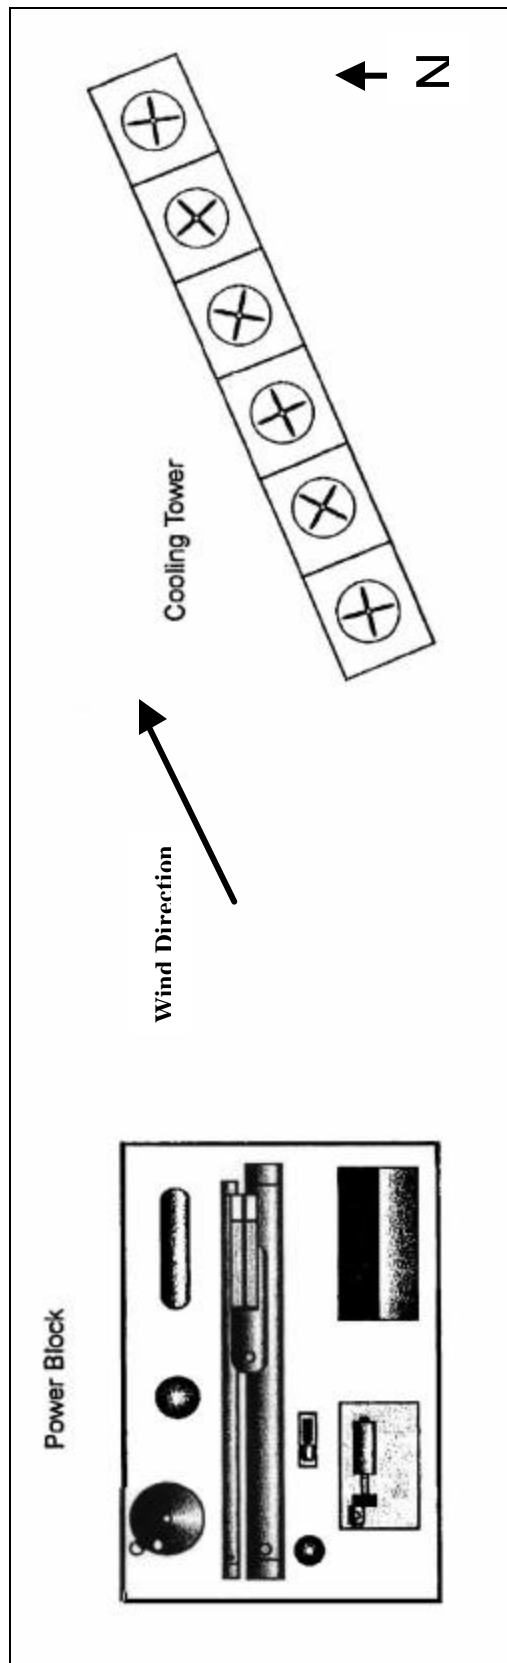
Proposed Power Block and Cooling Tower Layout
